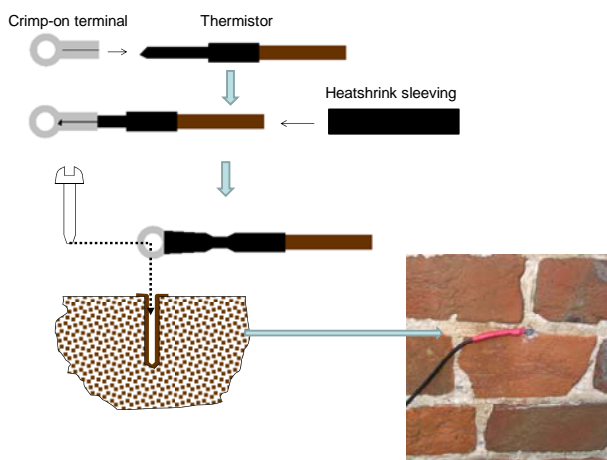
Method of mounting external surface temperature sensor to mortar joint not made where access was a problem, or fixing in the manner described would damage the external finish.
